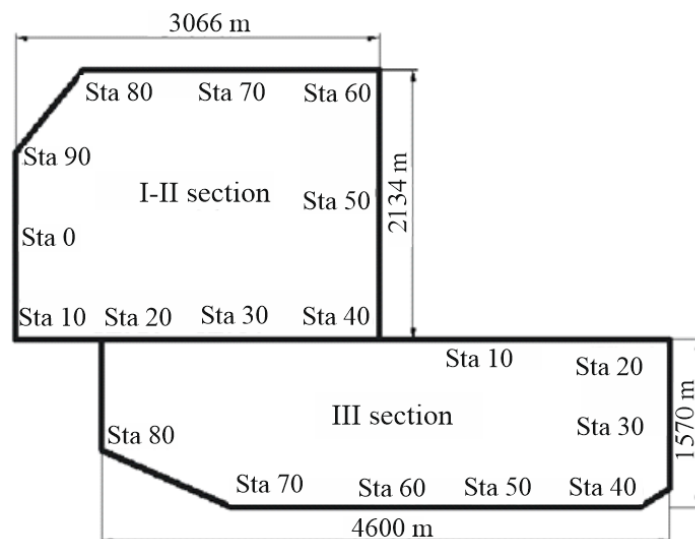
Diagram of the tailings storage facility plan of JSC “Poltava Mining and Processing Plant”.
